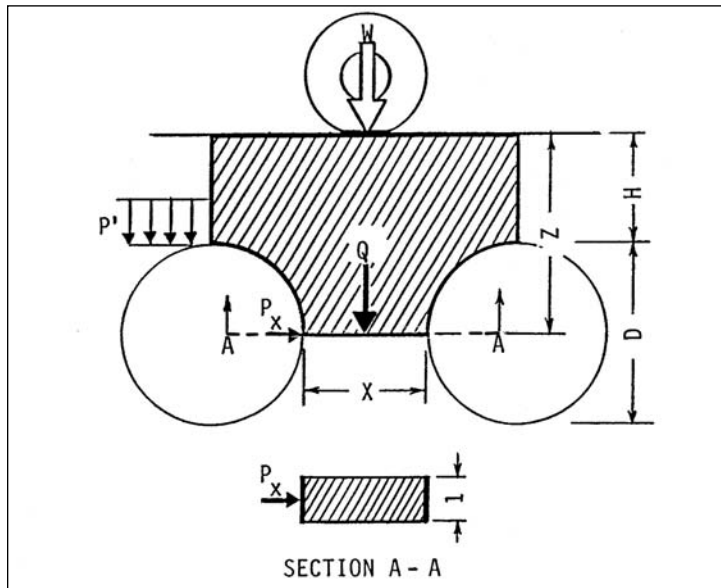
Load, Q , on a soil column Section A-A between parallel flexible pipes.
